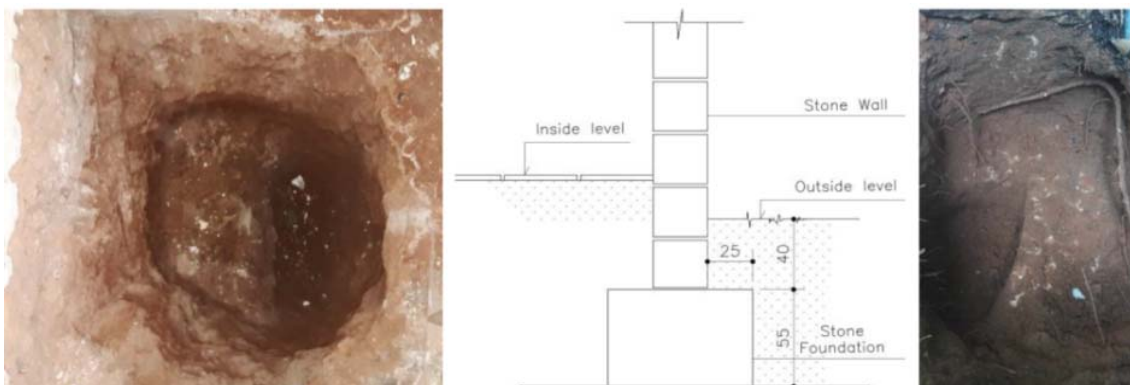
Exterior walls (kaaki house) are constructed on a stone foundation as shown (idem).
